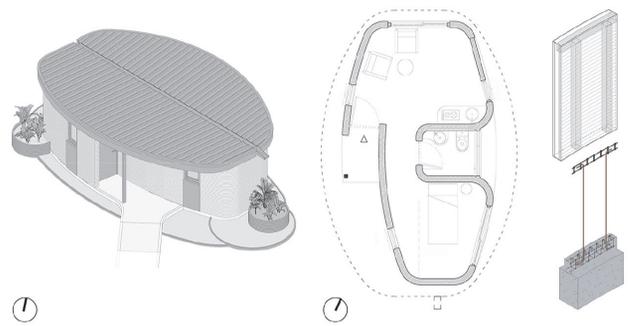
Architectural Design (left: aerial view; Centre: Plan, Right: Wall details)
